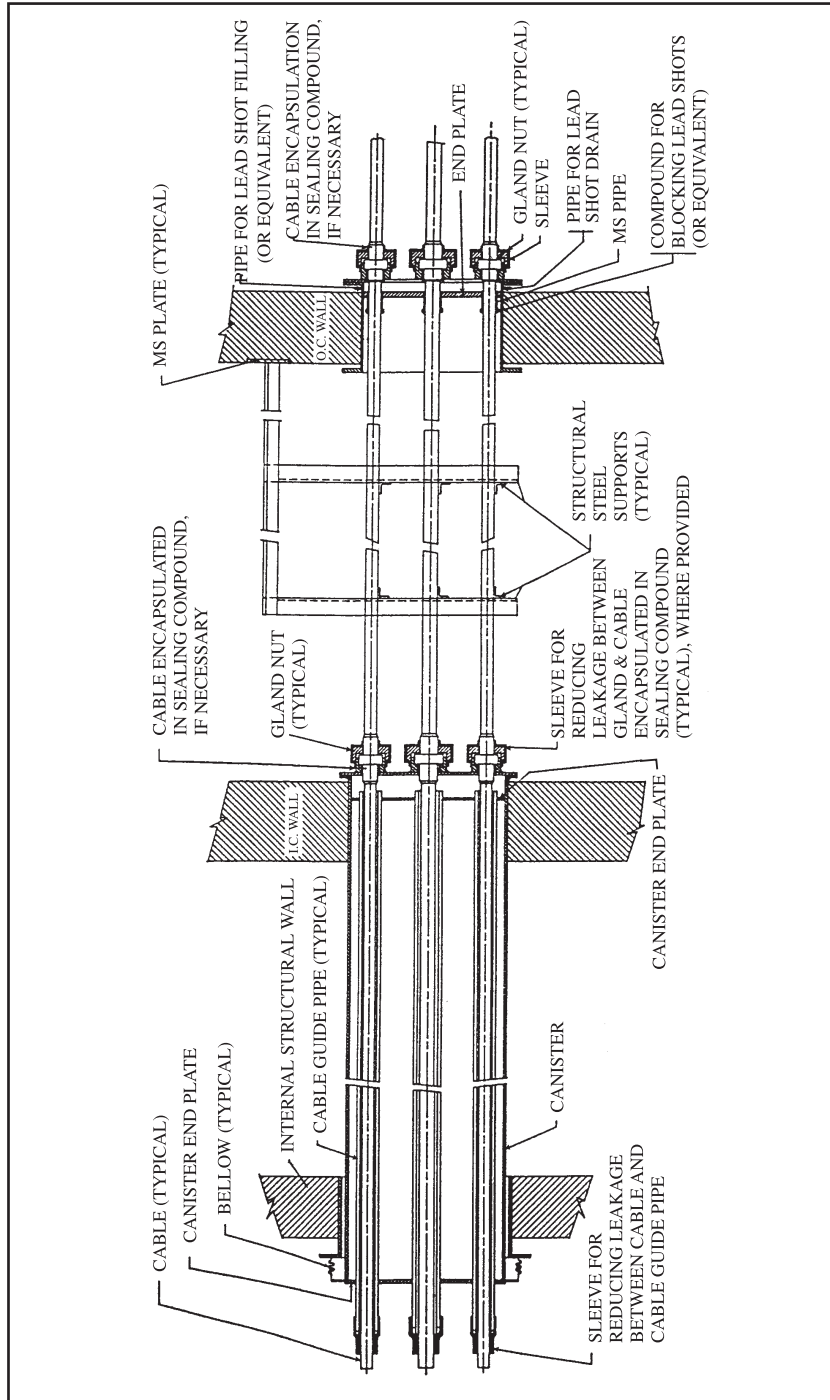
TYPICAL ARRANGEMENT FOR CABLE PENETRATION AND SEALING AT OCW, ICW AND STRUCTURAL WALL
